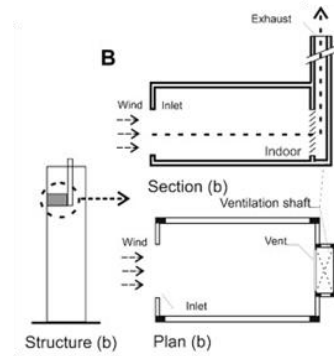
The design of Room B located at similar level with Room A in a 25-storey building. Room B has a ventilation shaft [8].
